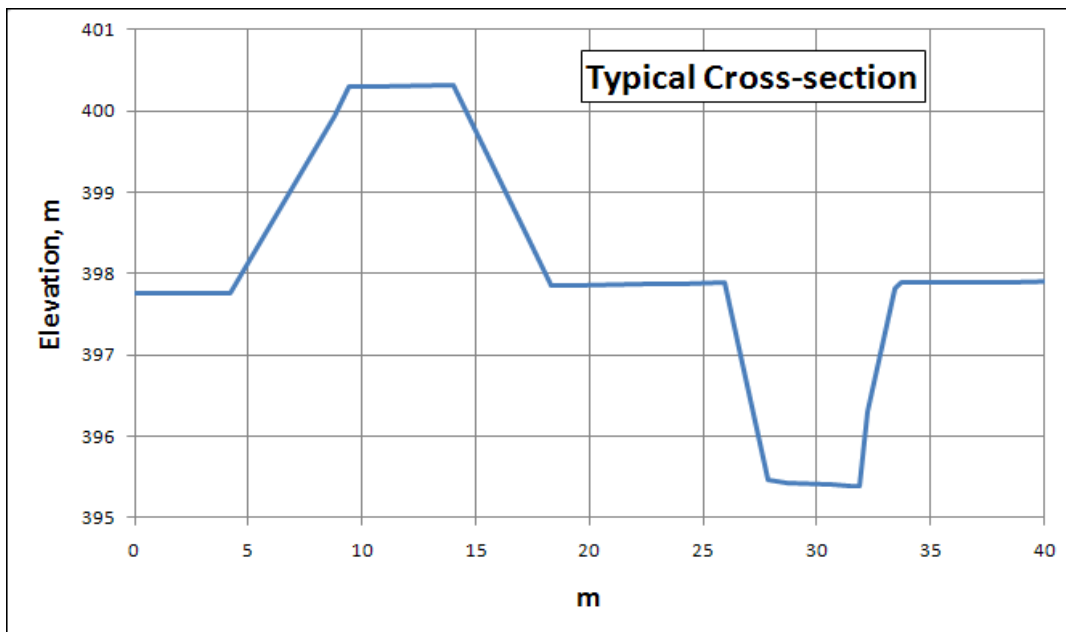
Alternative 2 typical cross-section with berm and ditch.
